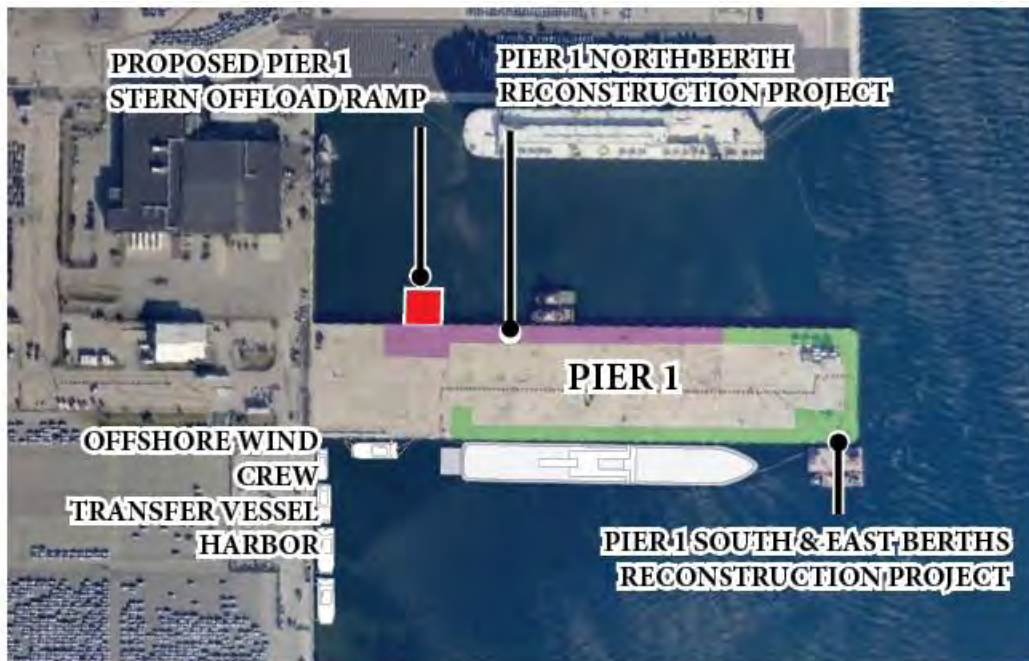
Proposed Pier 1 Stern Offloading Ramp Location
